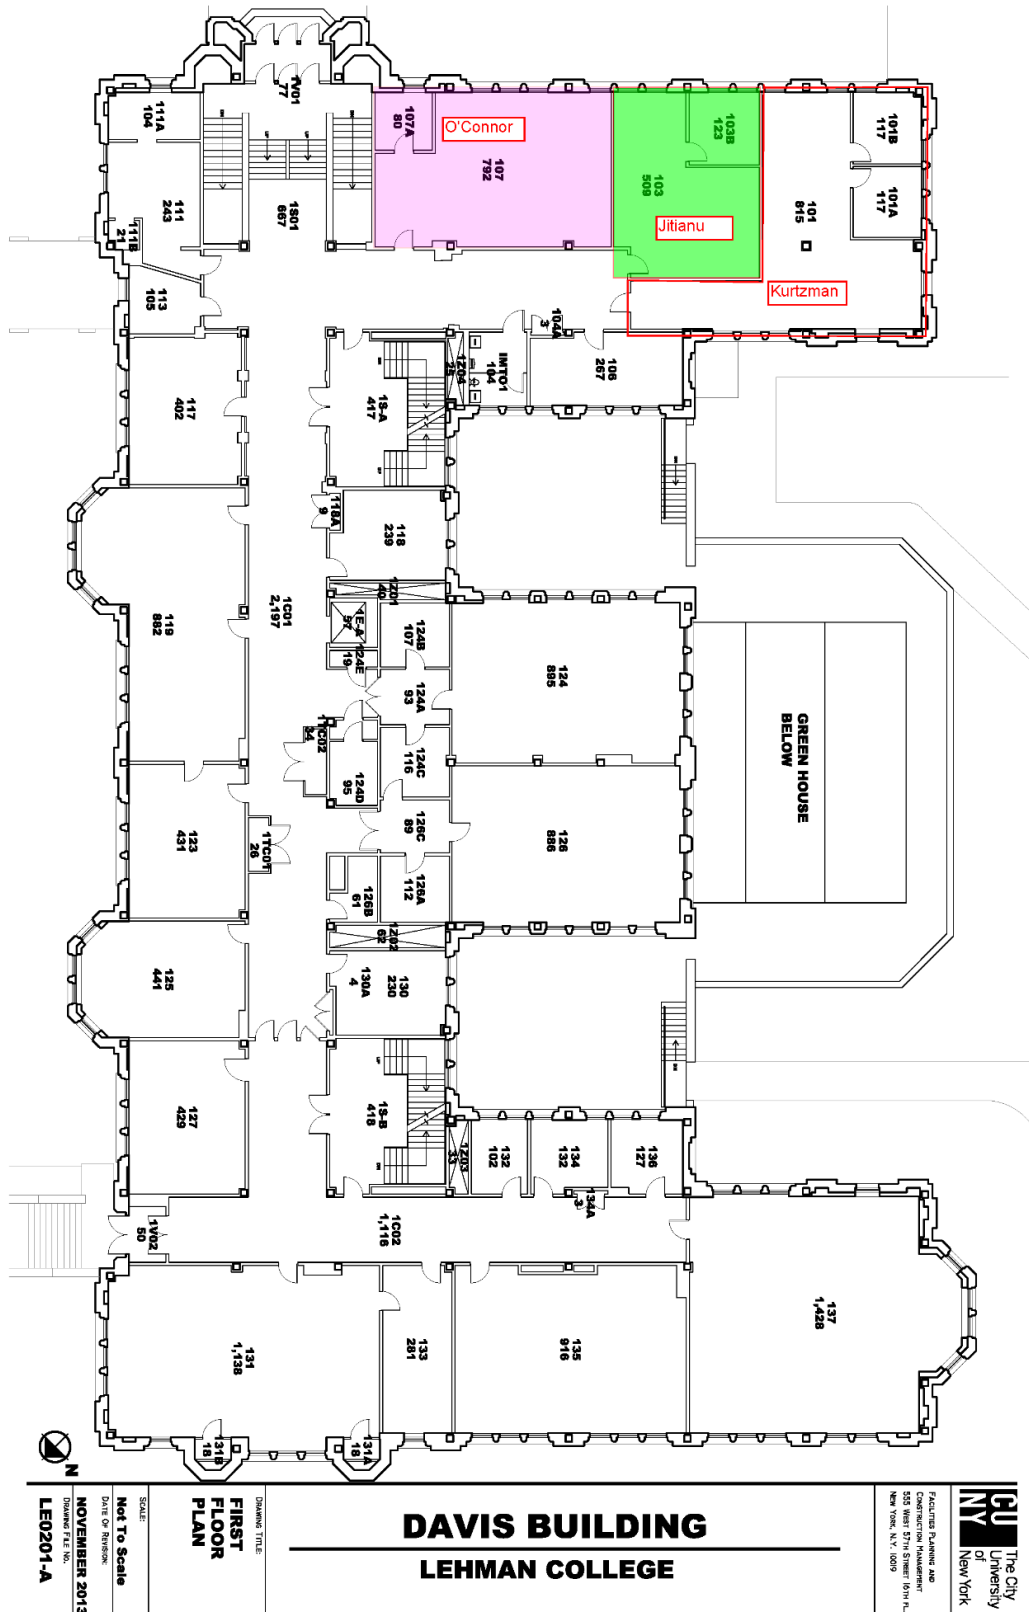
Floor plans for Davis Hall, 1st floor.
